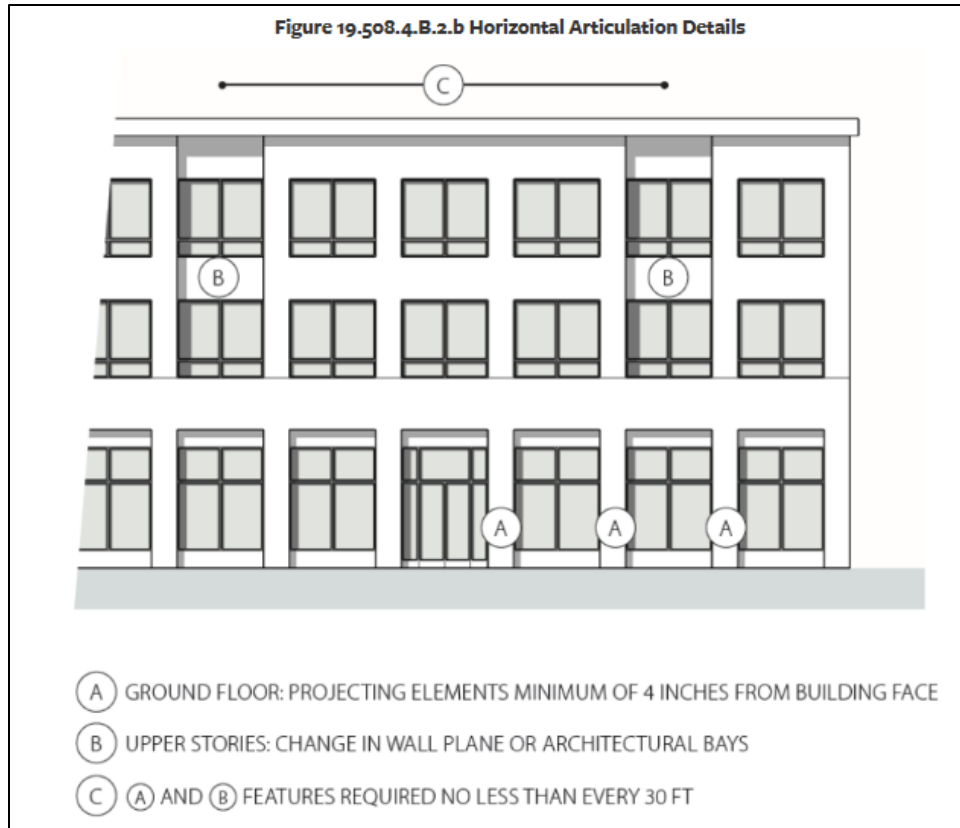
Downtown Design Standards - Horizontal Articulation Details
